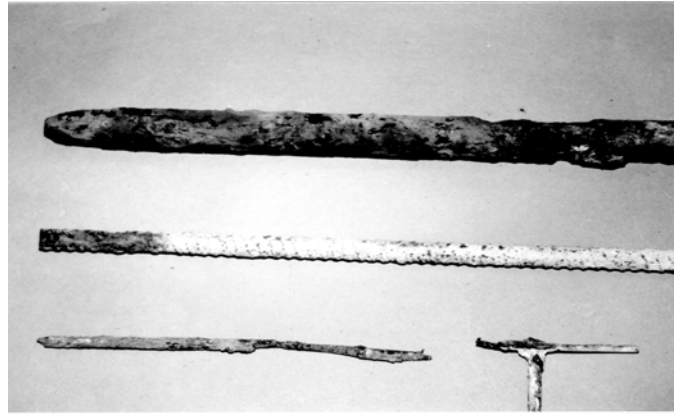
Corroded reinforcing steel and dowel bar from zones of carbonated concrete at cracks and at a joint.
